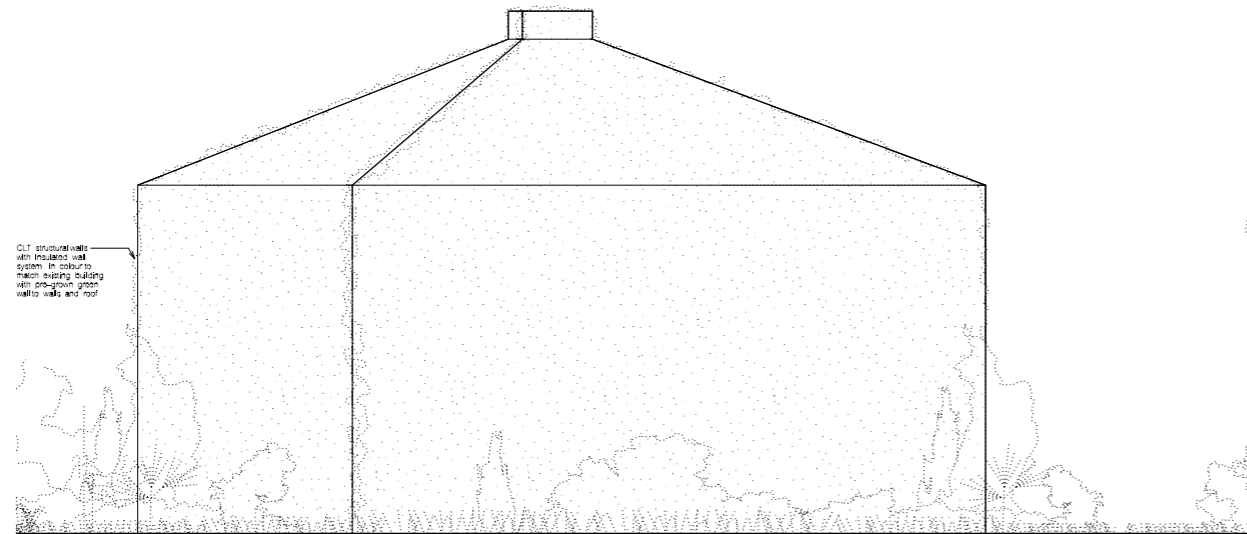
(L) Full application north facing 151 Headley Way elevation.
